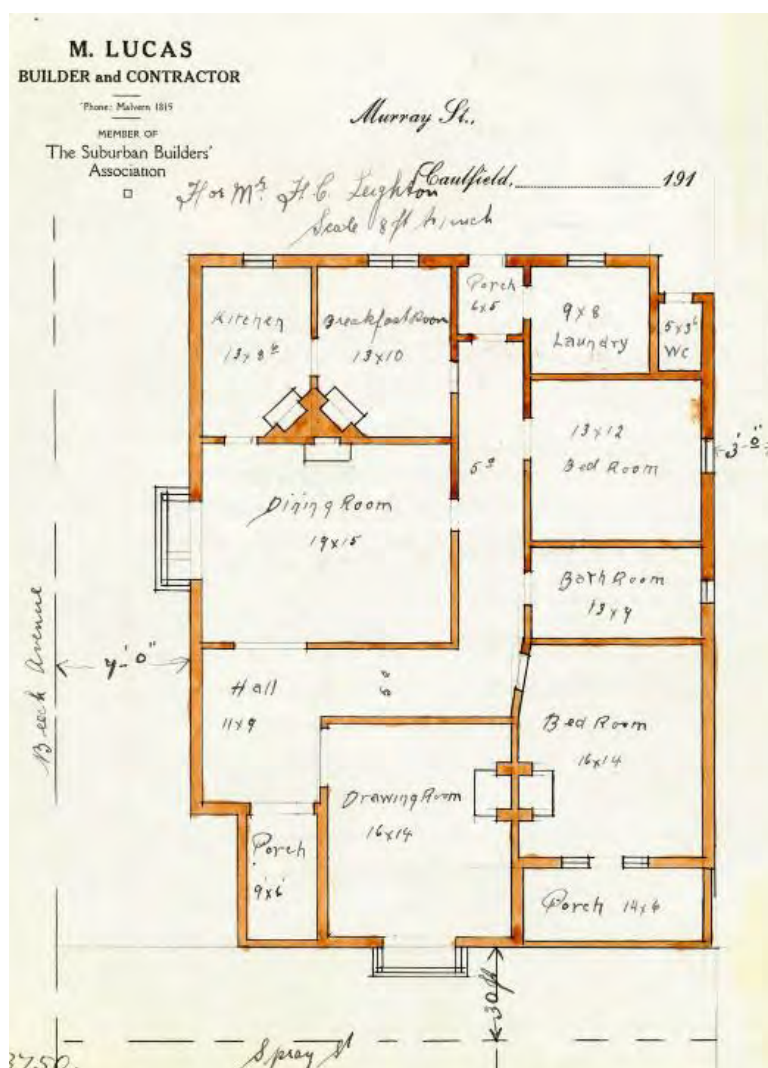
Floor plan of 'Brick villa to be erected on Allotment 504140 in Spray Street for F.C. Leighton. No 3750 in Building Survey Register.' 2 November 1918. Source: City of Port Phillip.
